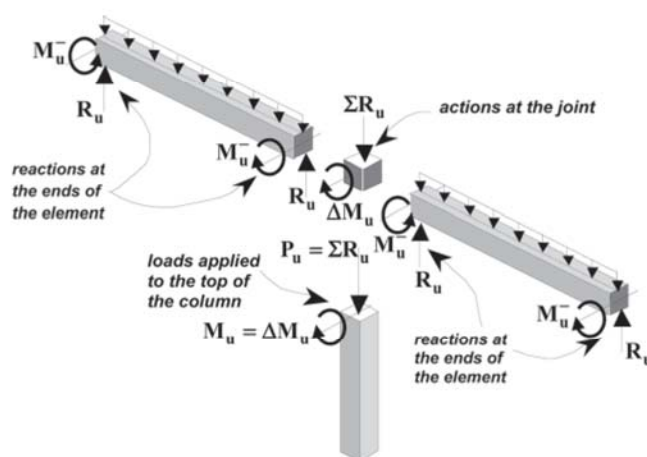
Factored column loads and moments from single floor and in one direction.
